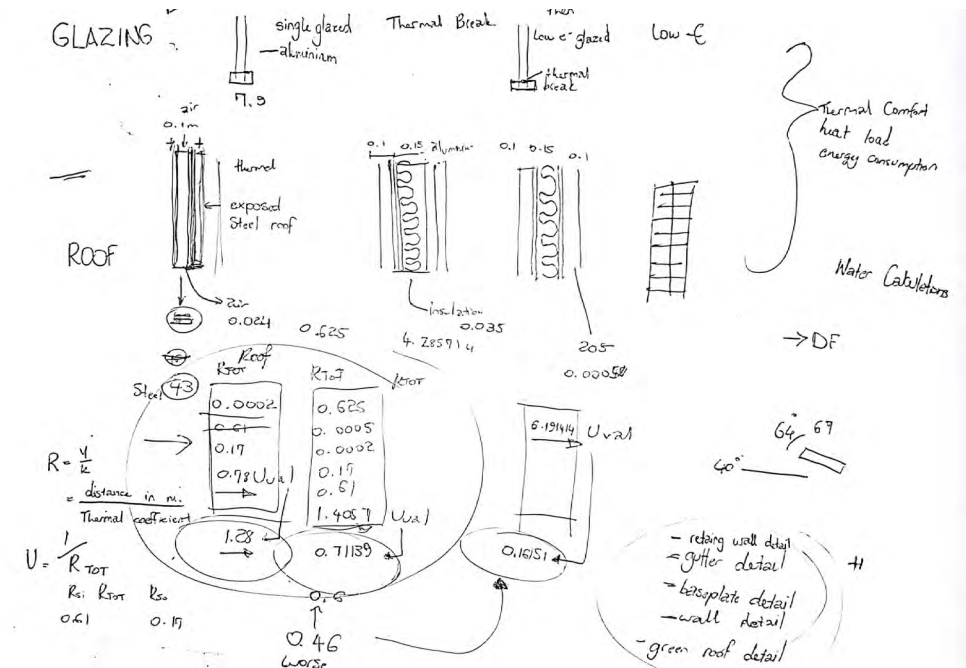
Process thermal calculations for roof cladding (Author, 2017)
